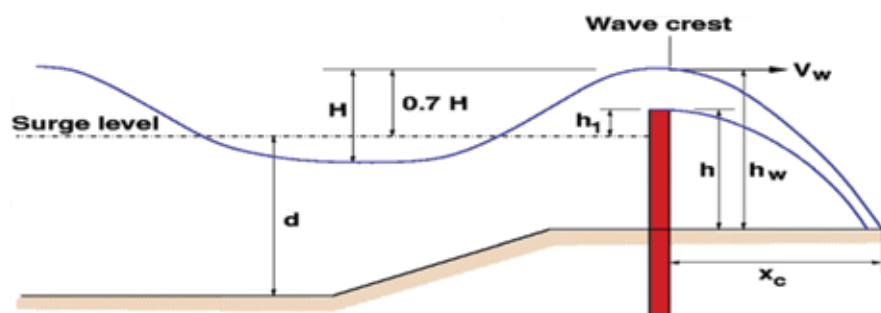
Definition sketch of wave overtopping flood wall (USACE, 2008)
